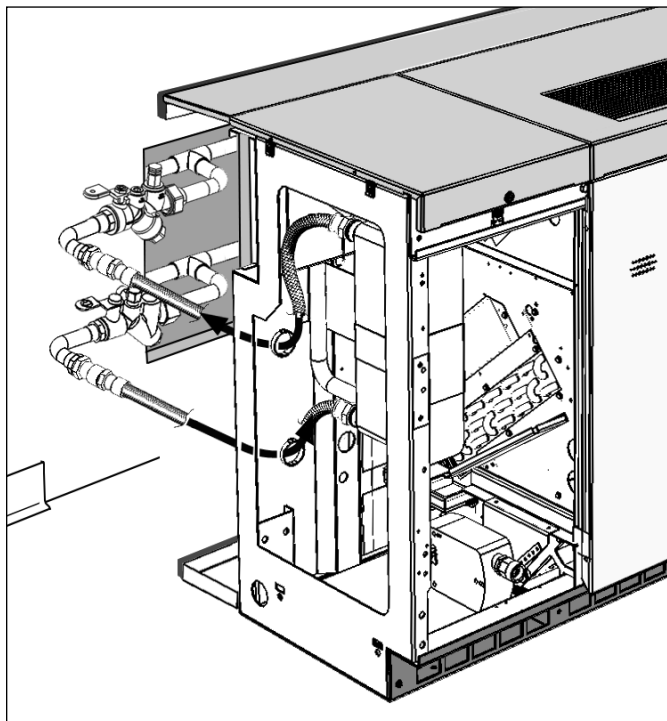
Water supply and return connections (unit size 040 & 048 shown)
